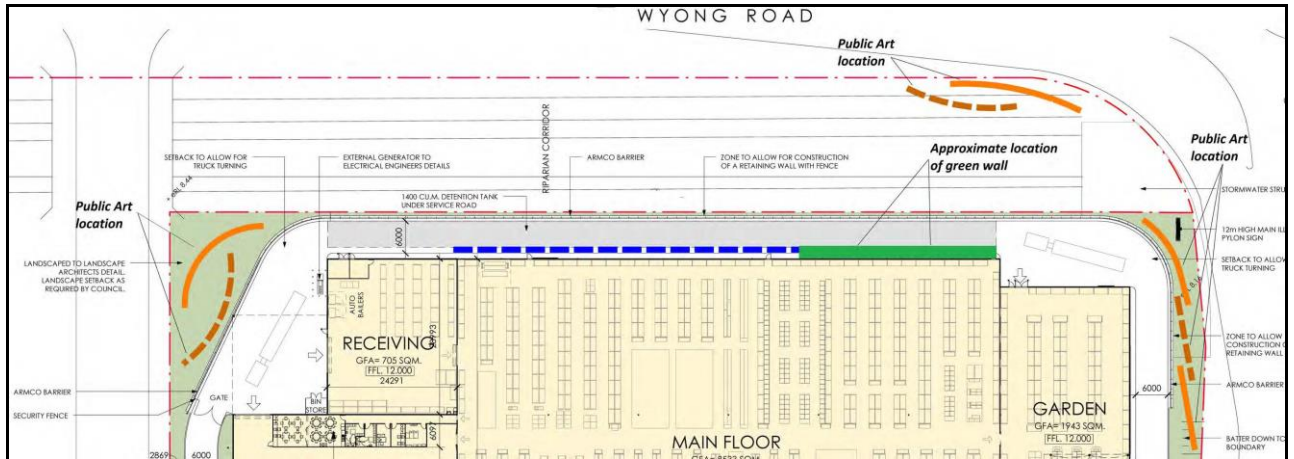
Plan showing location of proposed public art at the Wyong Road/Tonkiss Street intersection and the intersection of Road 2 and Wyong Road.
